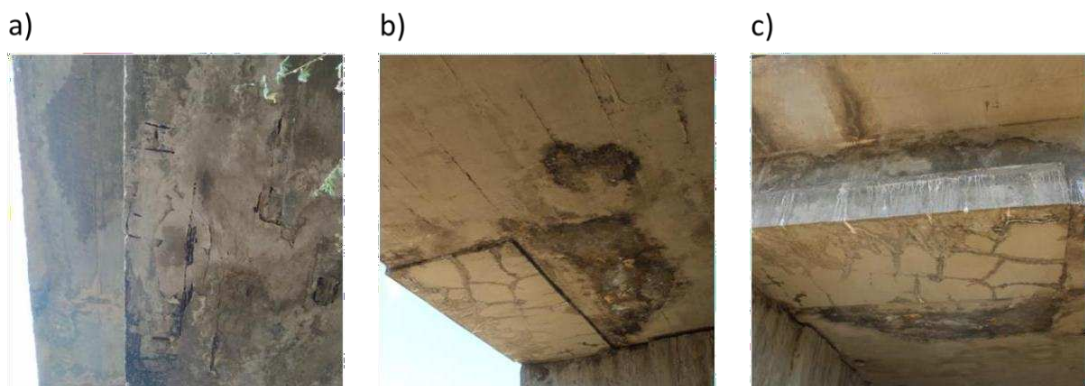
Recurring bridge damage 01 and 02; a) Damage at 2020 inspection; b) and c) Damage in 2023 inspection
